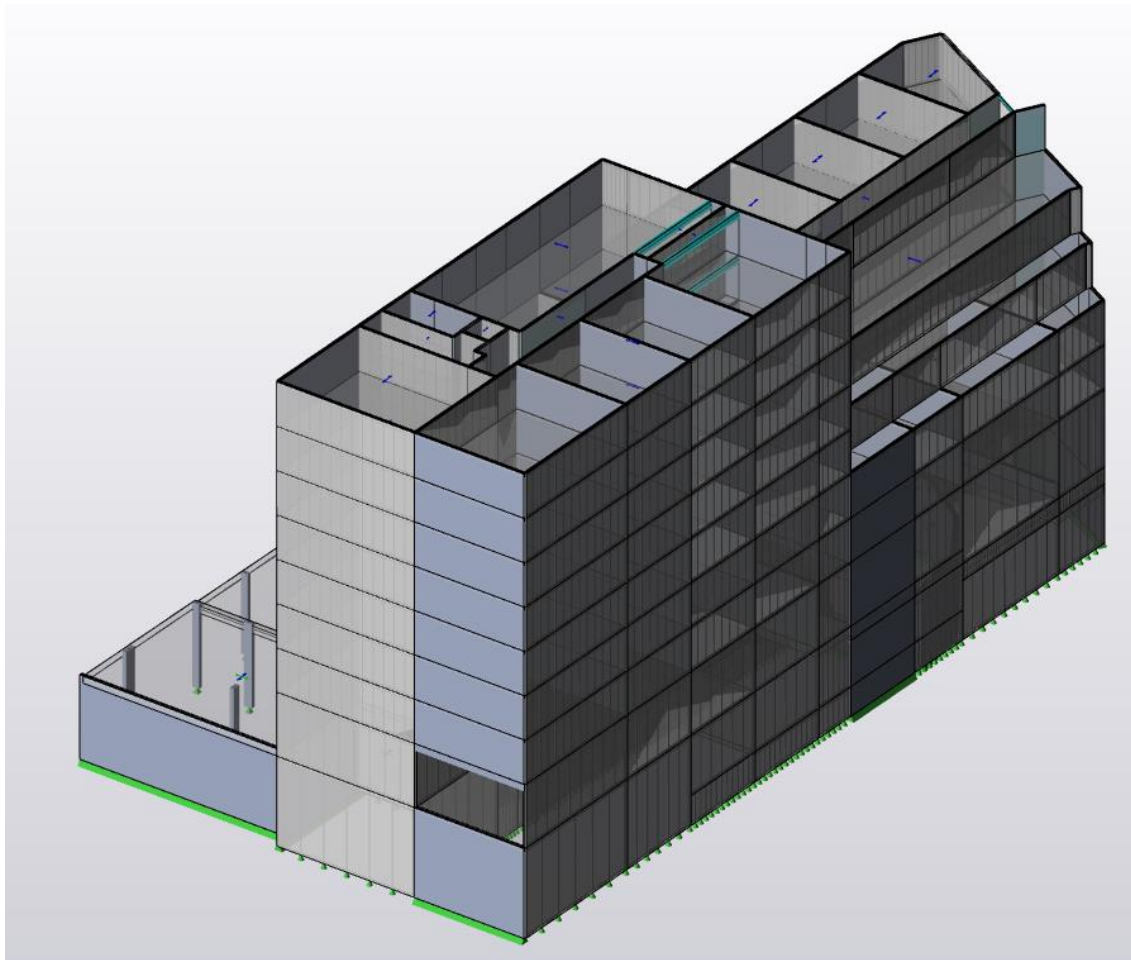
Block A2 precast slabs on masonry / RC cross wall construction above ground floor level (view from south)
